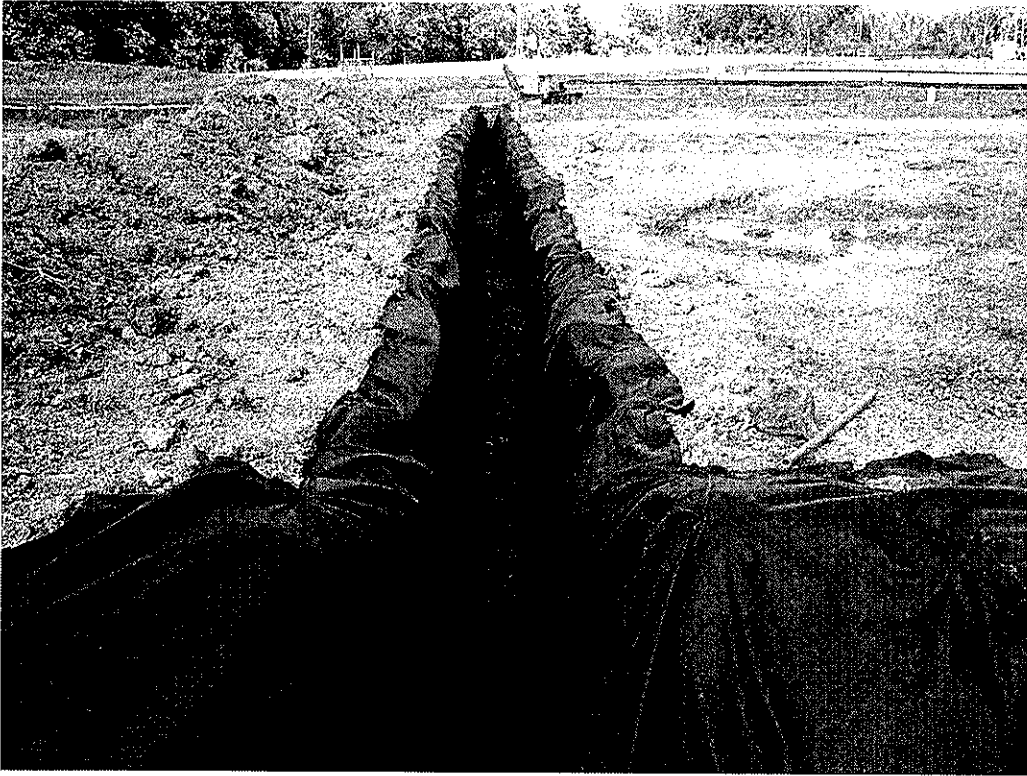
Phase II – Excavation and marker layer for Electrical Conduit Installation.
